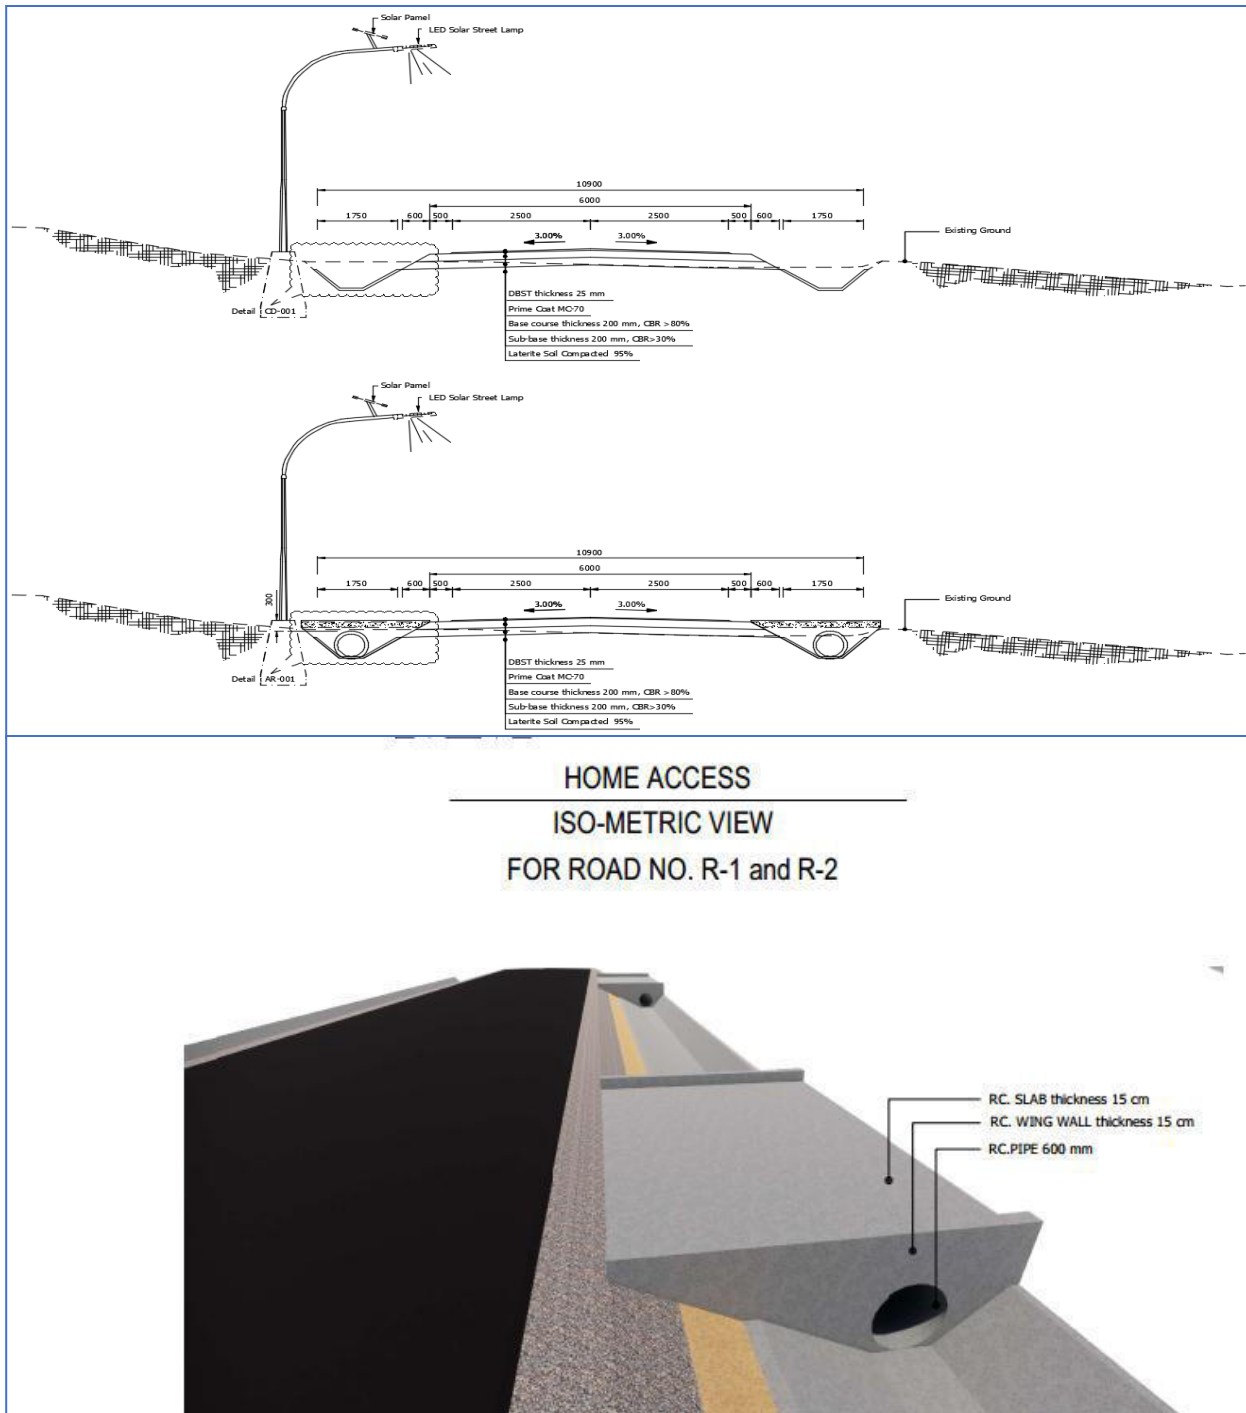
Ban Alone Access Road: R1 Typical Cross Section
